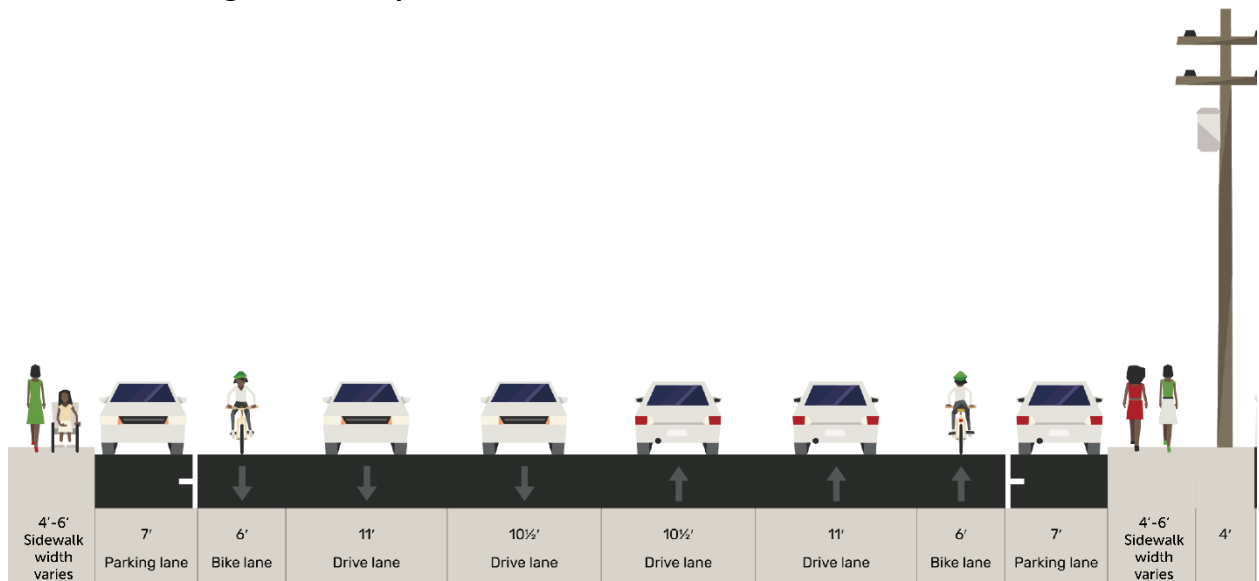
Draft Concept Alt A: Typical Cross-section North of Central Expressway
